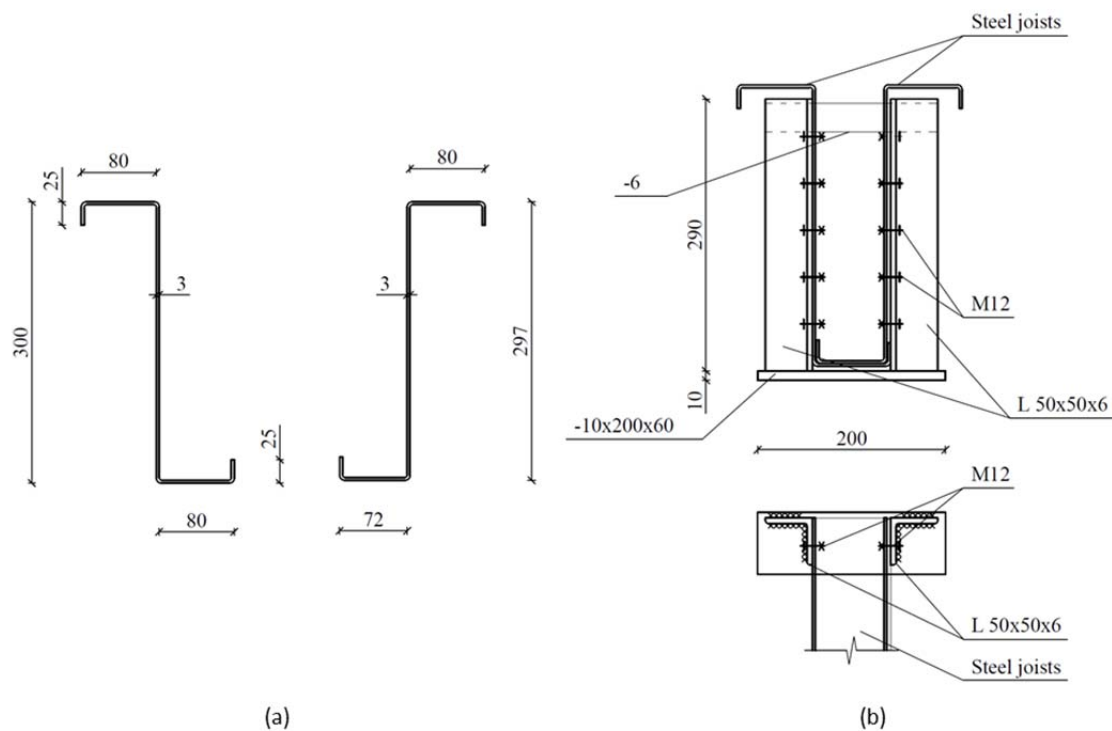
Modular lightweight floor and roof panel MP2: (a) details of steel joists and (b) details of supports
